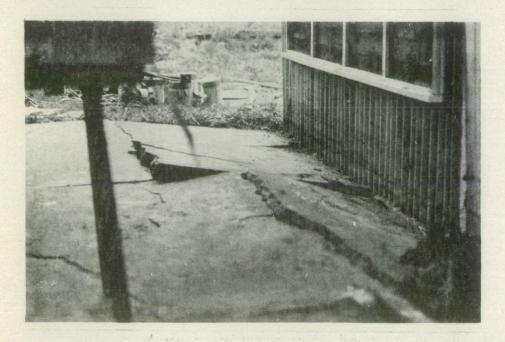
Subsidence of building containing heavy machinery, and tsunami strandlines on walls, P & T power house, Torokina.
